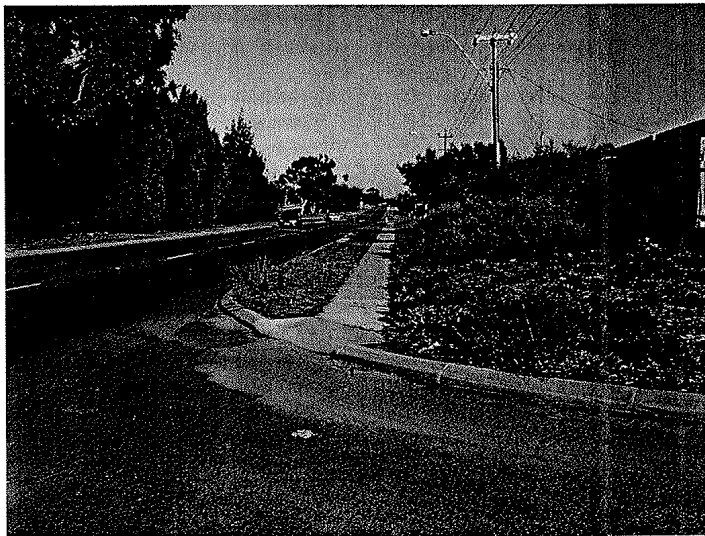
Looking west along Warwick Road from the Currajong Road intersection
